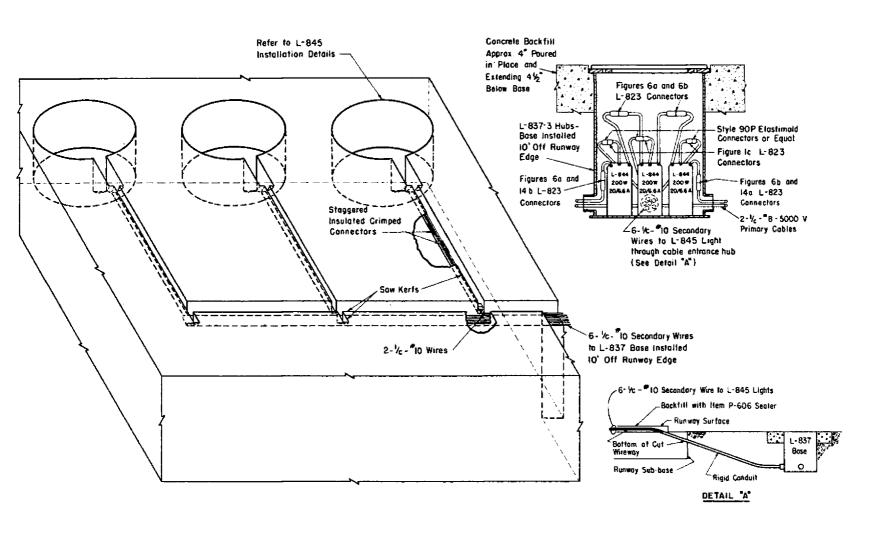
PRIMARY AND SECONDARY WIRING DETAILS -L-845 INSET PRISMATIC AIRPORT LIGHT
